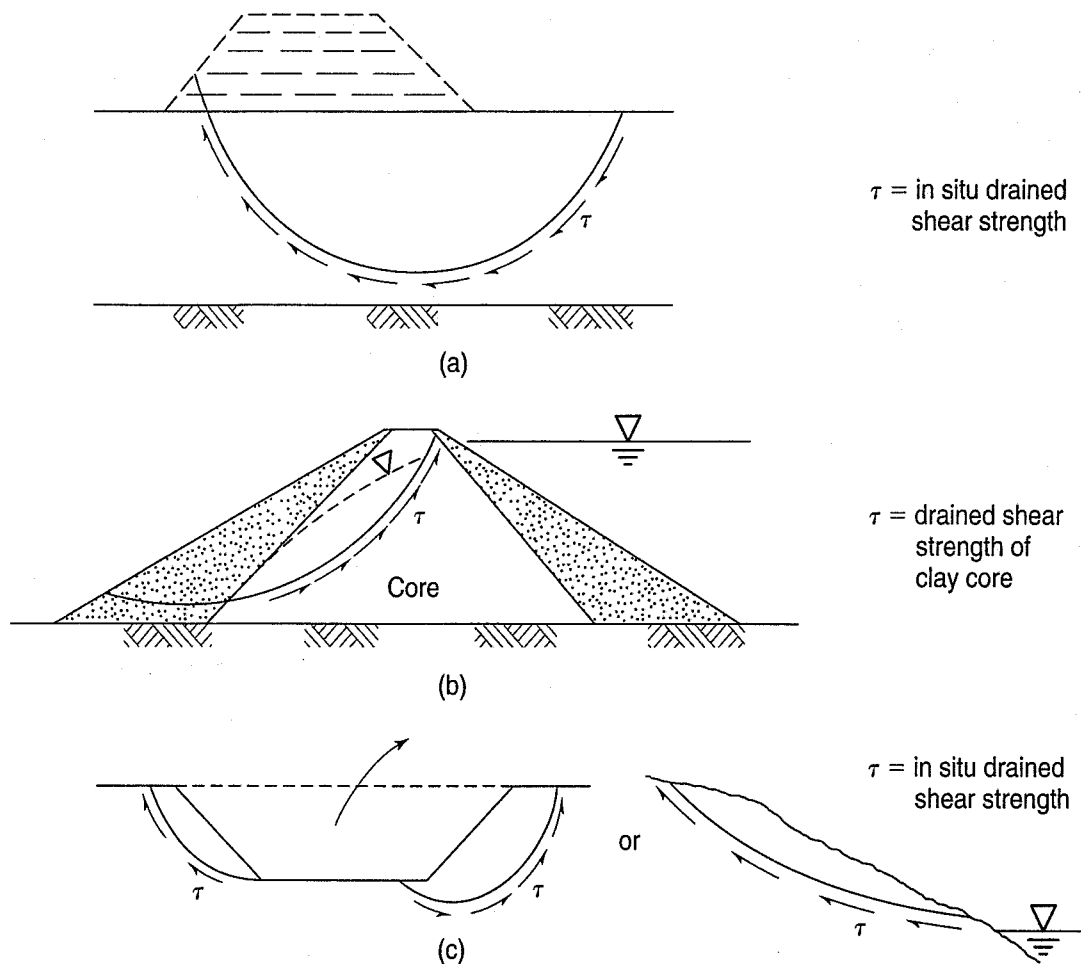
Some examples of CD stability analyses for clays (after Ladd, 1971b): (a) embankment constructed very slowly, in layers, over a soft clay deposit; (b) earth dam with steady-state seepage; (c) excavation or natural slope in clay.
